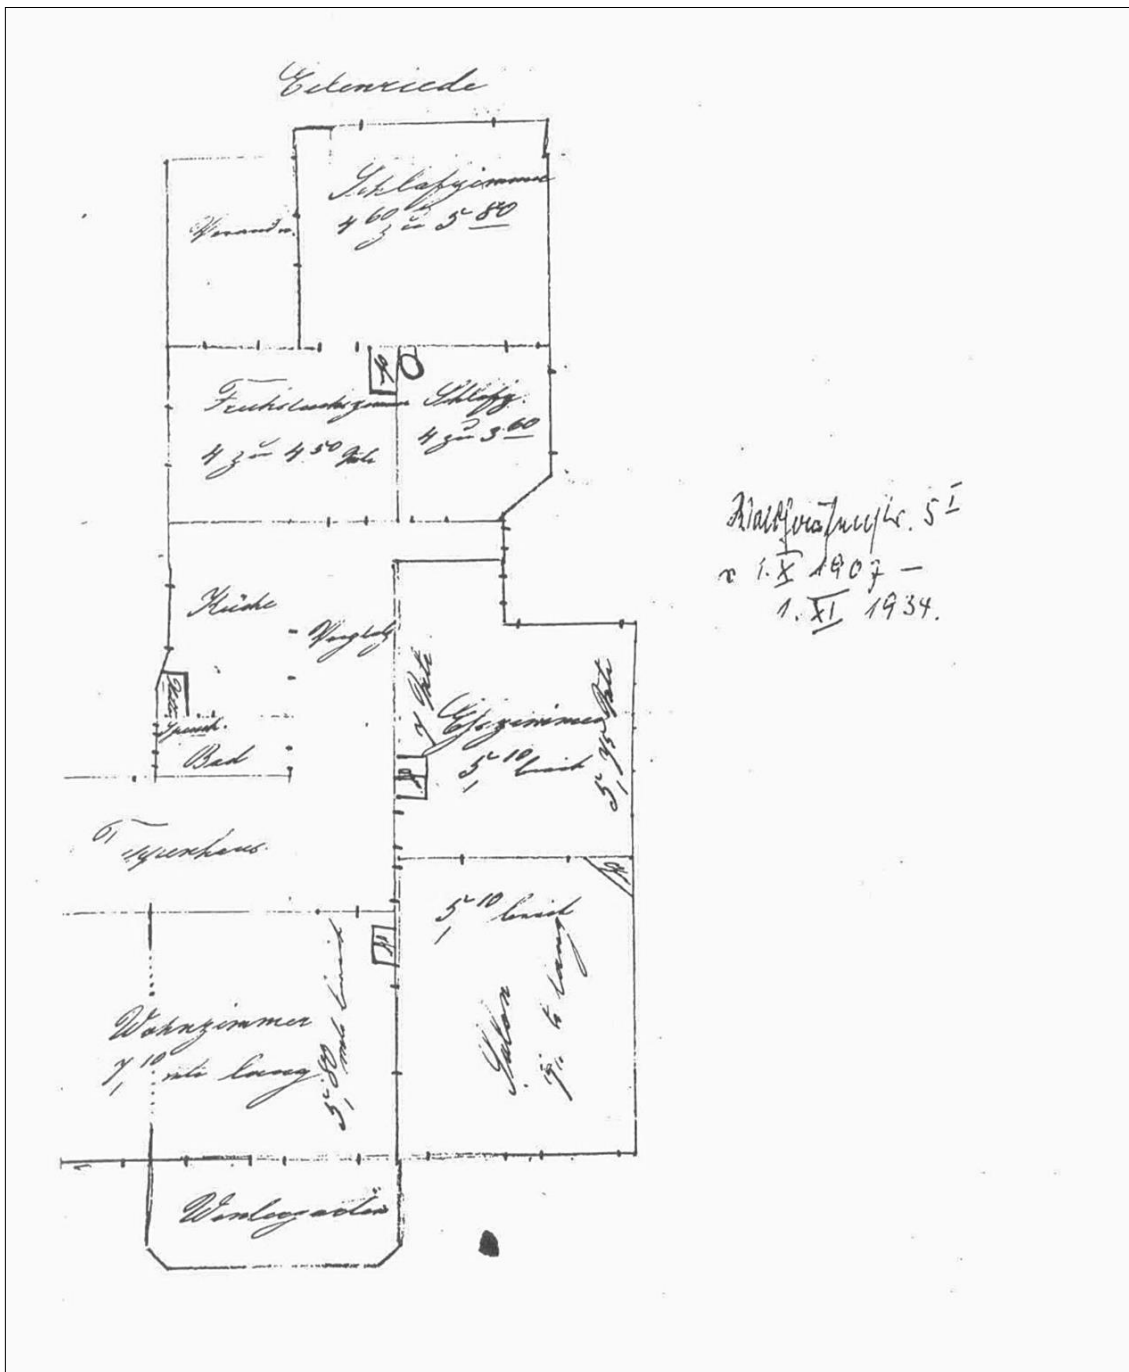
Plan of Waldhausenstrasse 5, 1st floor.
